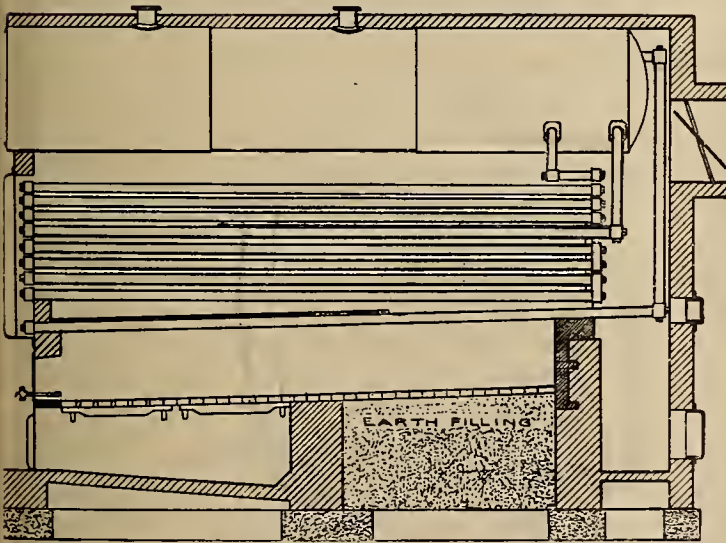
S. &amp; P. Furnace Arrangement Under Parker Boiler.
